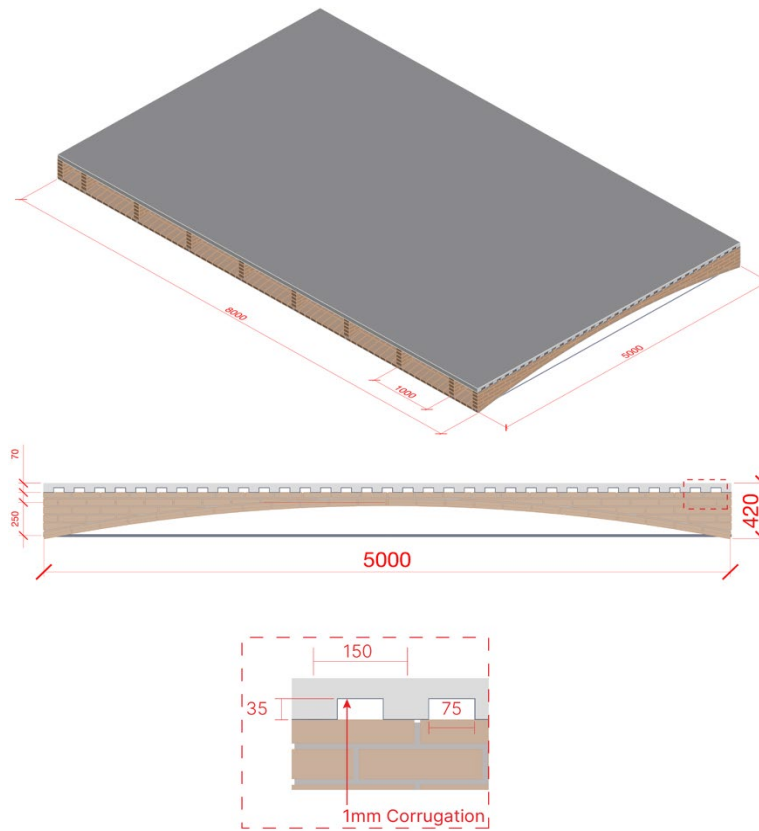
Earthen Vaulted Floor Design 2 (mm)
